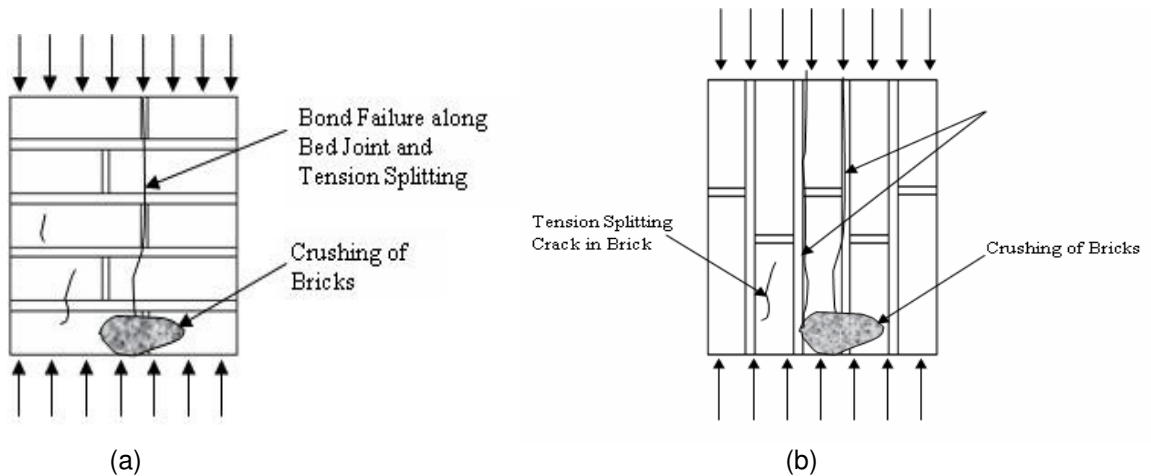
Failure Mode of the Wallettes under Compression (a) Loading Normal to Bed Joints and (b) Parallel to Bed Joints.
